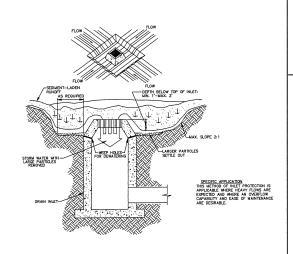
EXCAVATED INLET SEDIMENT TRAP N.T.S.
